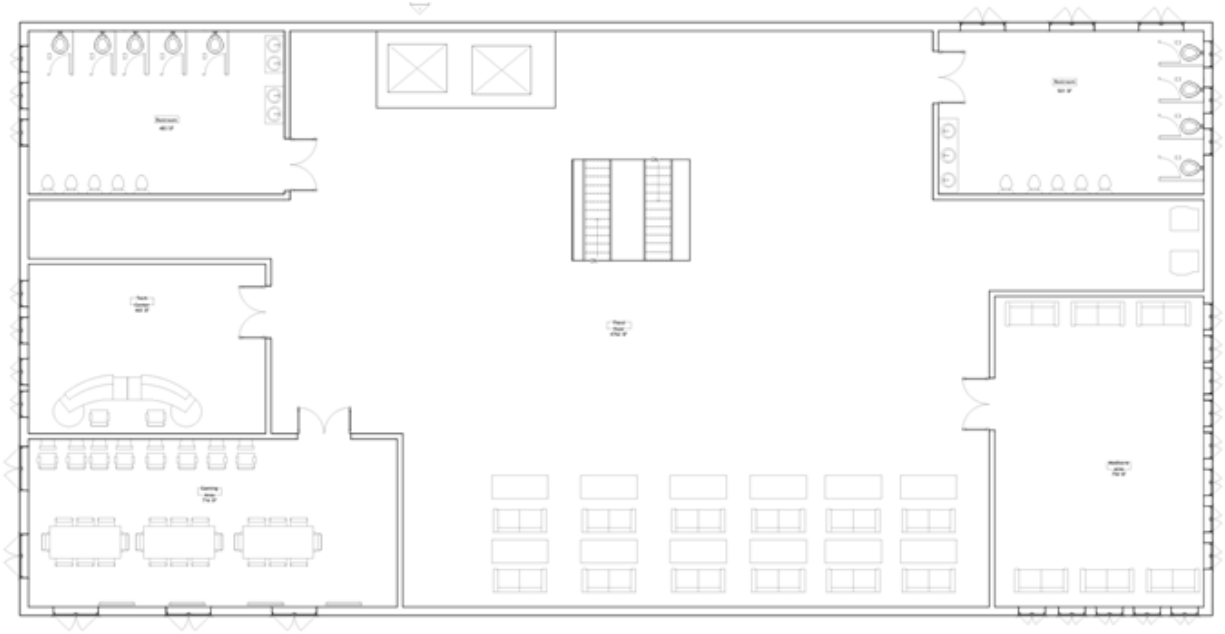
Second floor plan of the Common Grounds Student Center.
